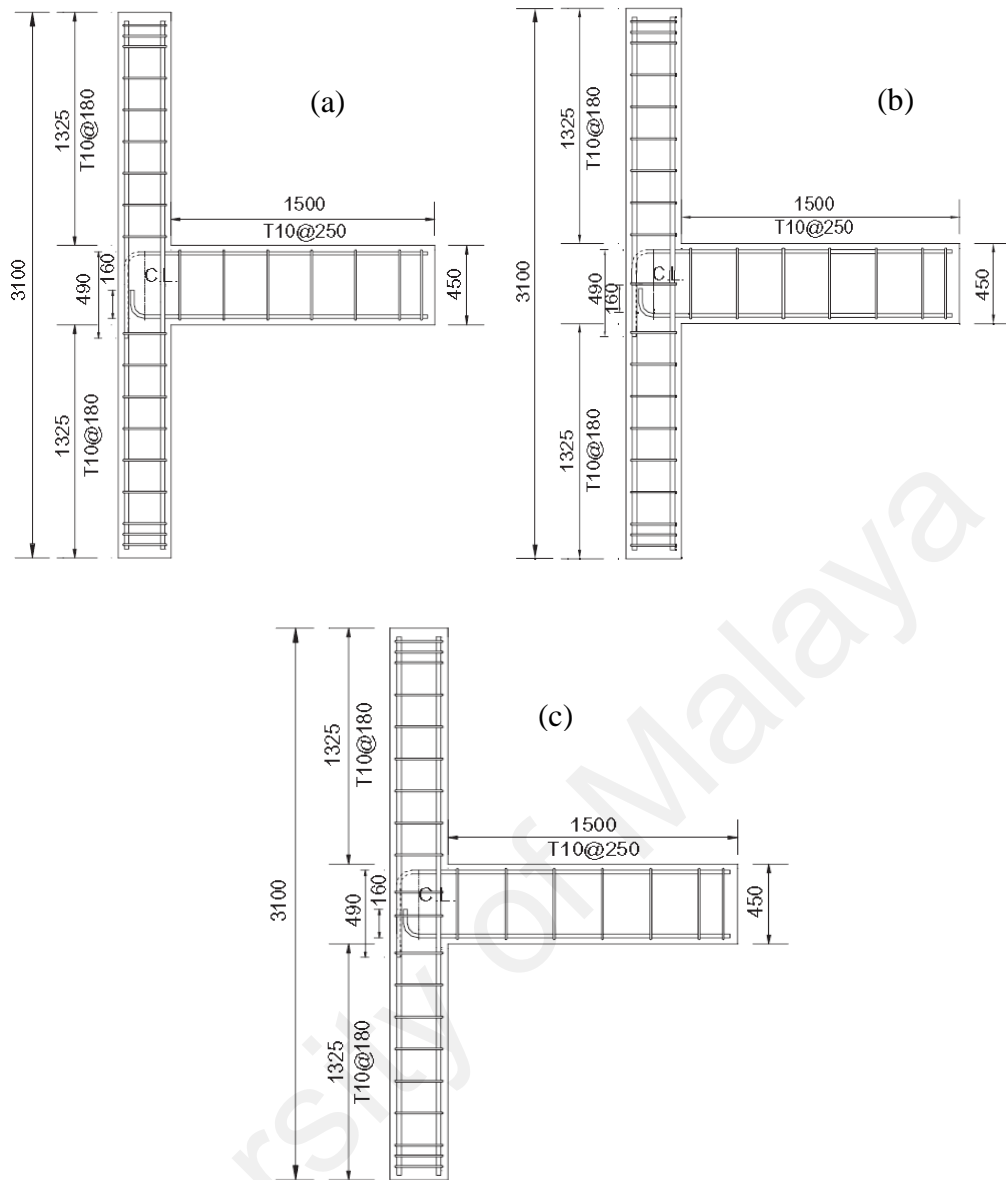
Various reinforcement details in beam-column joints (a) no stirrup (b) one stirrup (c) two stirrups (Wong & Kuang, 2008)
